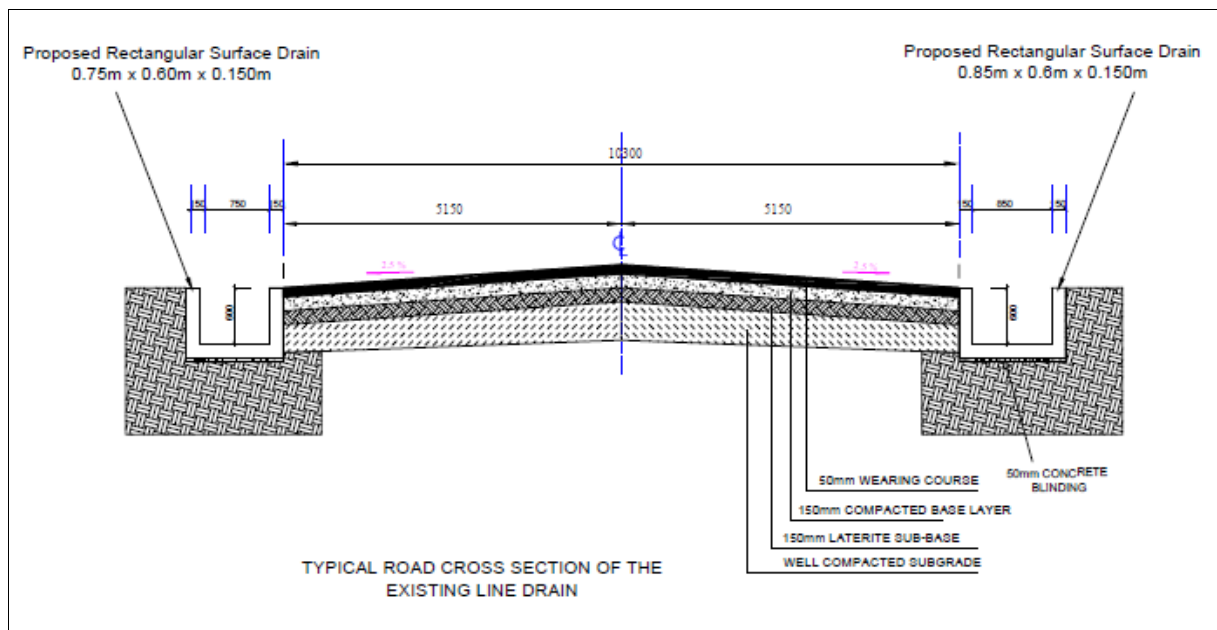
Typical Road Cross Section of the Existing Line Drain.
